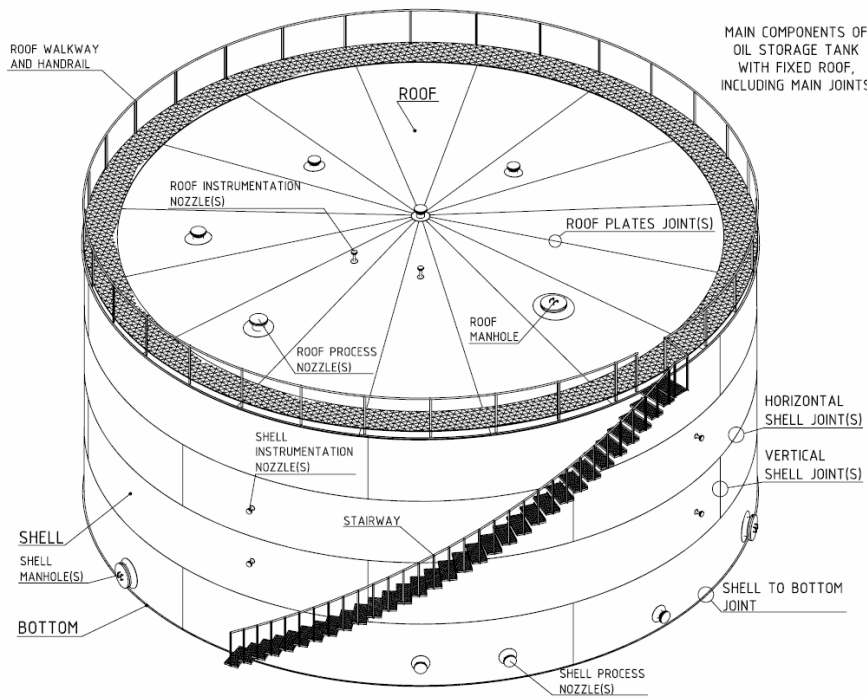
Basic parts of oil storage tank with fixed roof [3]
